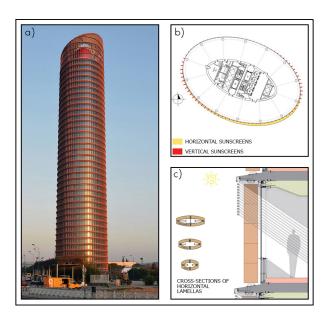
Torre Sevilla, Sevilla, 2016: a – view; b – façade design scheme dependent on the orientation; c – detail of the façade solution
